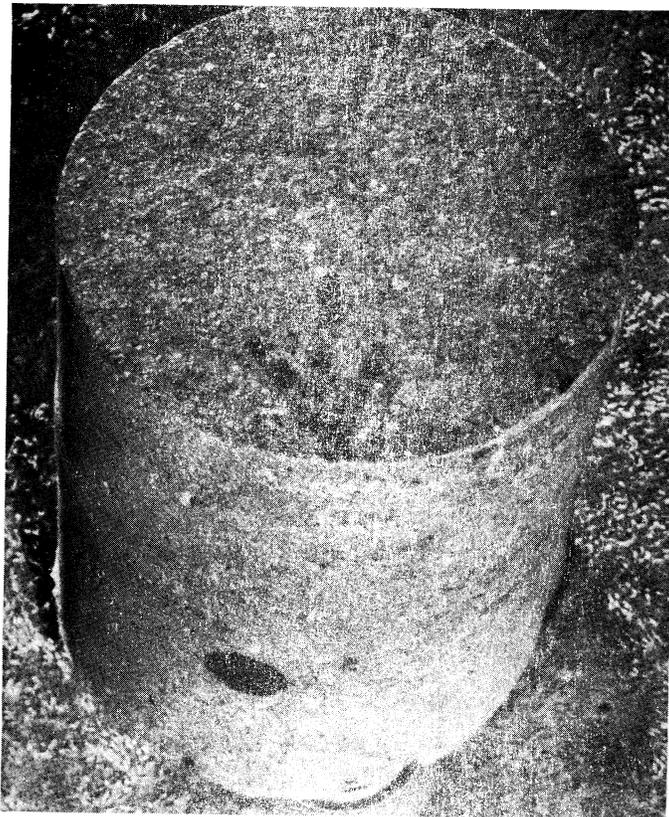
Longitudinal cracking in a concrete core with latex mortar overlay. Arrow on top of core denotes direction of traffic.
